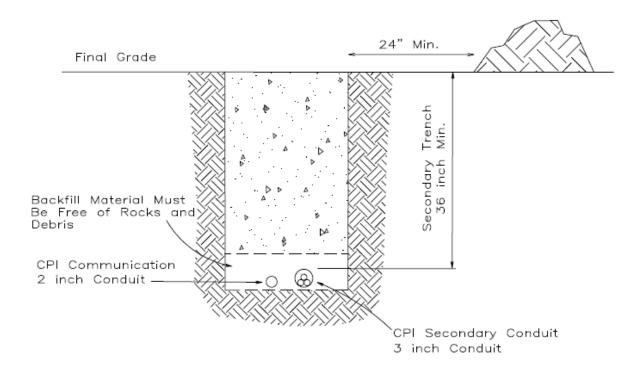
Secondary Trench Horizontal Configuration Detail
